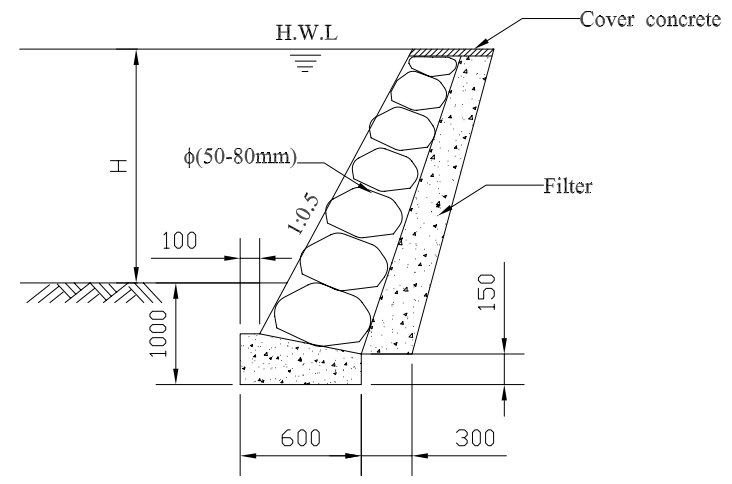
DETAIL OF EMBANKMENT PROTECTION TYPE P.1
